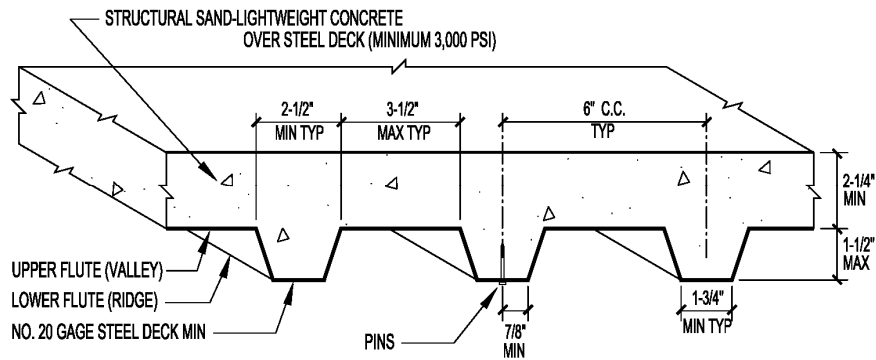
C—FASTENER INSTALLATION IN LOWER FLUTES OF 1 1/2-INCH-DEEP STEEL DECK PROFILES
